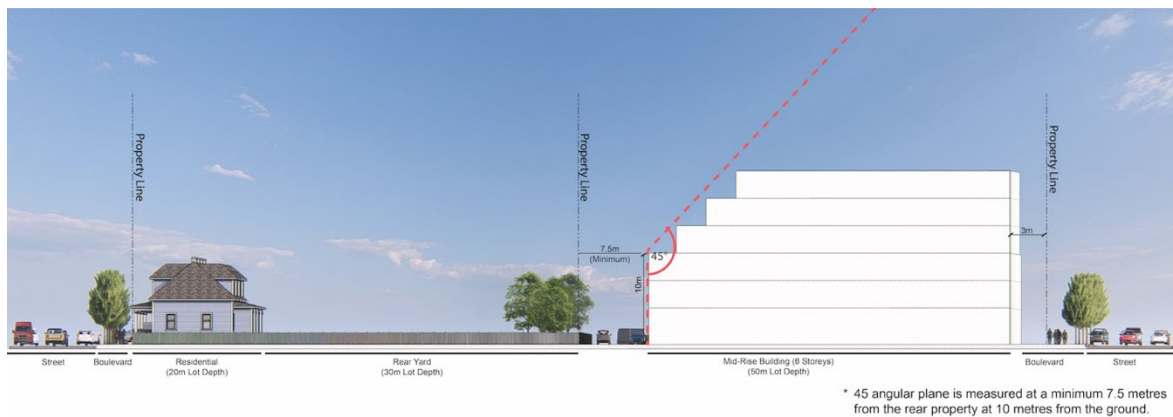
b: Angular Plane Abutting Residential Use for a 6 storey building
